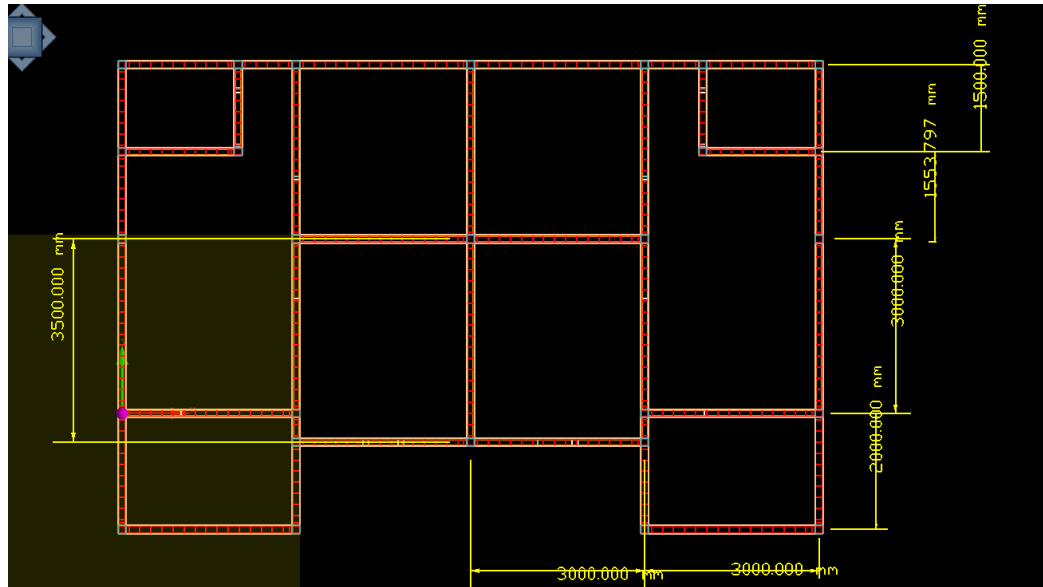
13. Lay Out of One of RC Buildings Numerical Model
